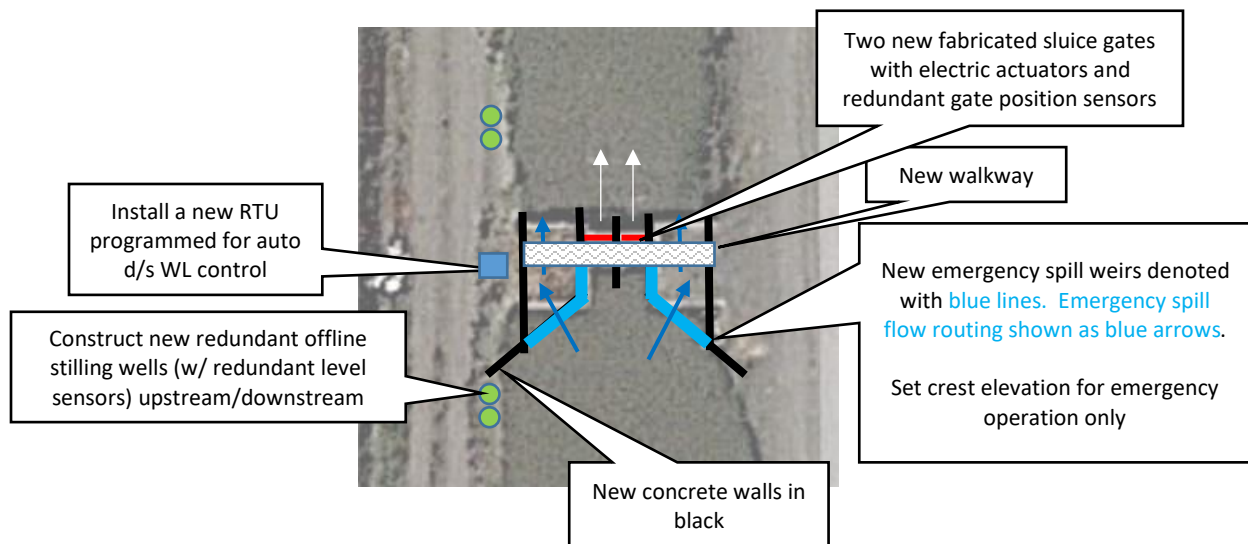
Conceptual drawing showing the new automatic downstream control structure, plan view
